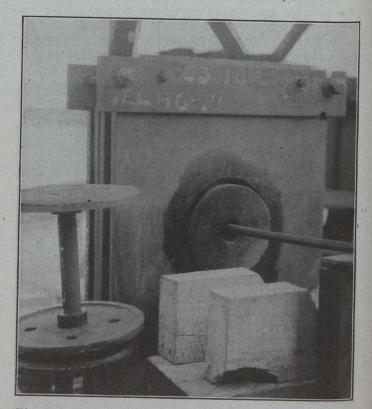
Close View of One of the Eight Forged-Steel Lifting Pins Resting in Hole in Stub End of Lifting Girder, Showing Clearance Workmen Had in Driving Lifting Pins. At the Left is a Pair of Caps for the Pin. The Connecting Bolt Goes Through the Centre of the Pin and the Caps Screw on
